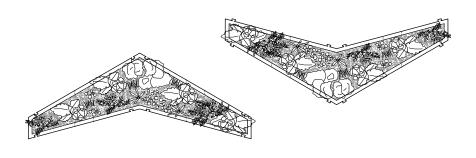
Modules showing the assembly of a male and female component where one rotates 180° to fit in with the other.
